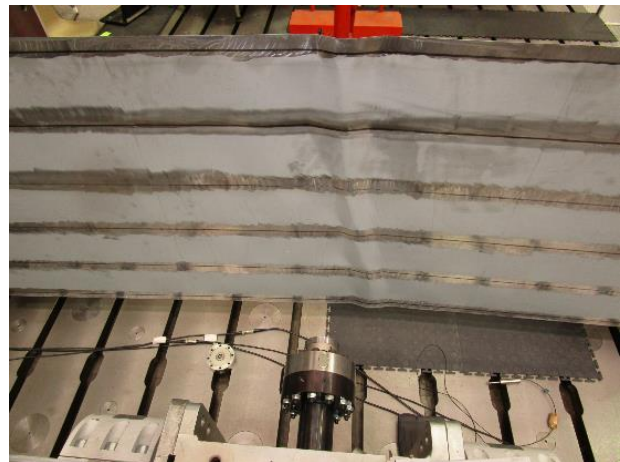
b: Steel floor developed by the CRMGroup company after welding
